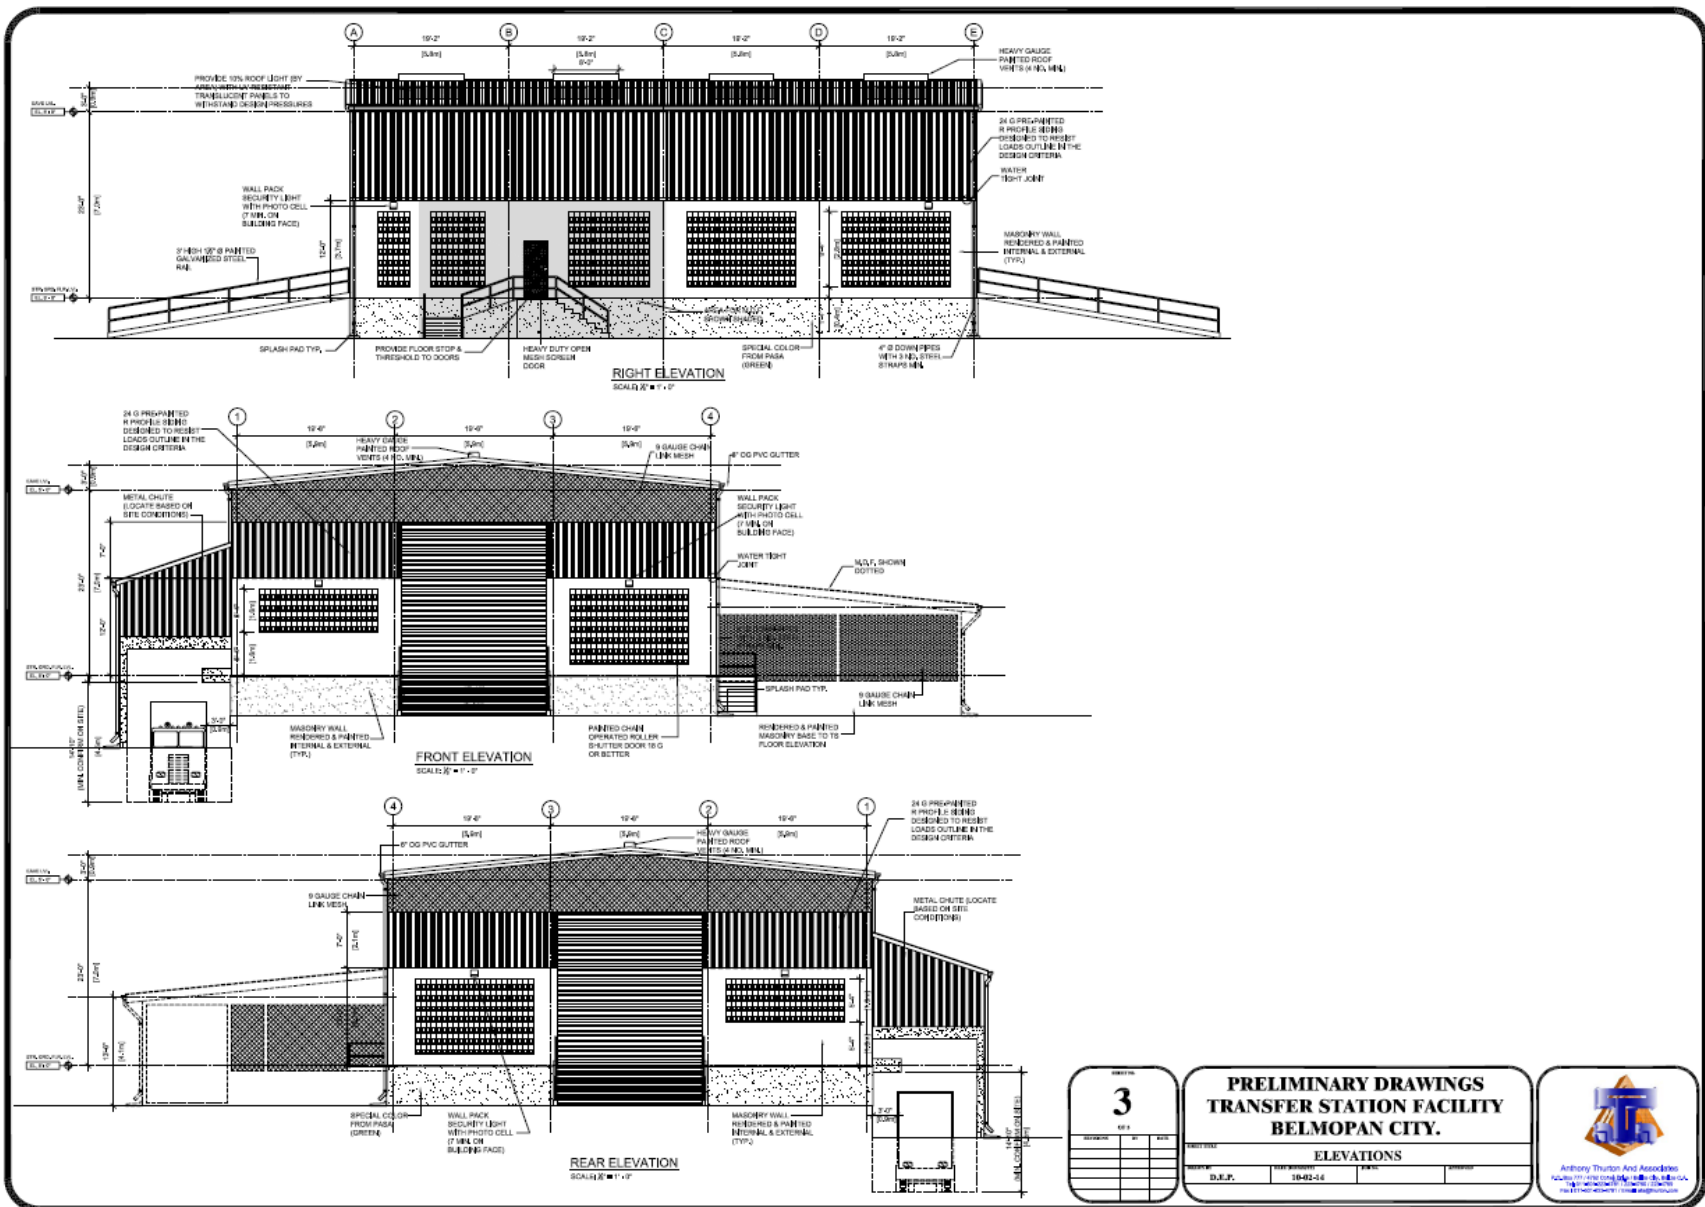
Proposed Belmopan Transfer Station Elevations
